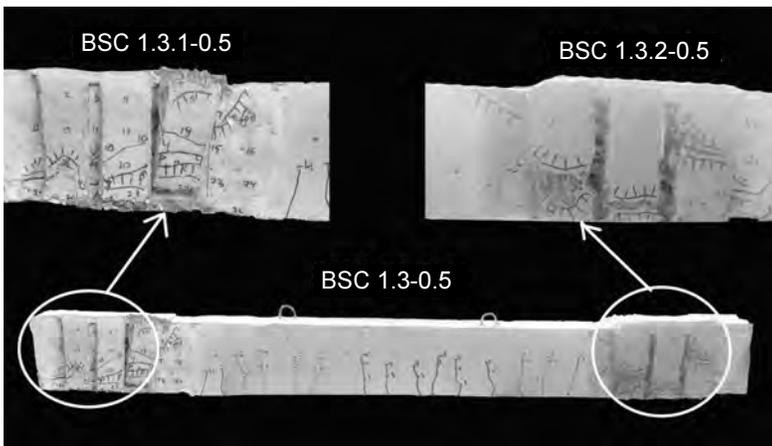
The tested strengthened beam BSC 1.3-0.5
